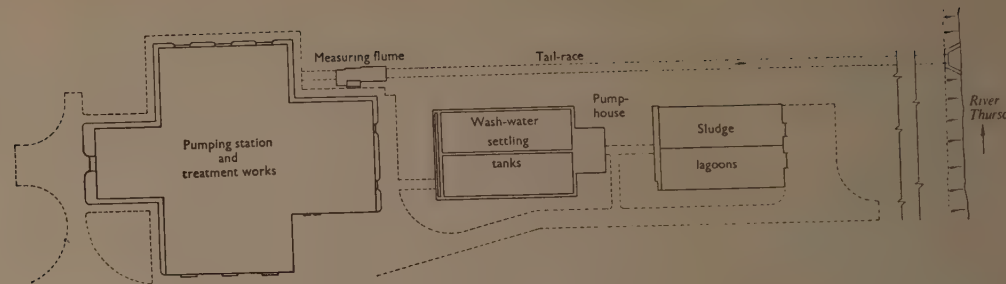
HOY WORKS—GENERAL LAYOUT
